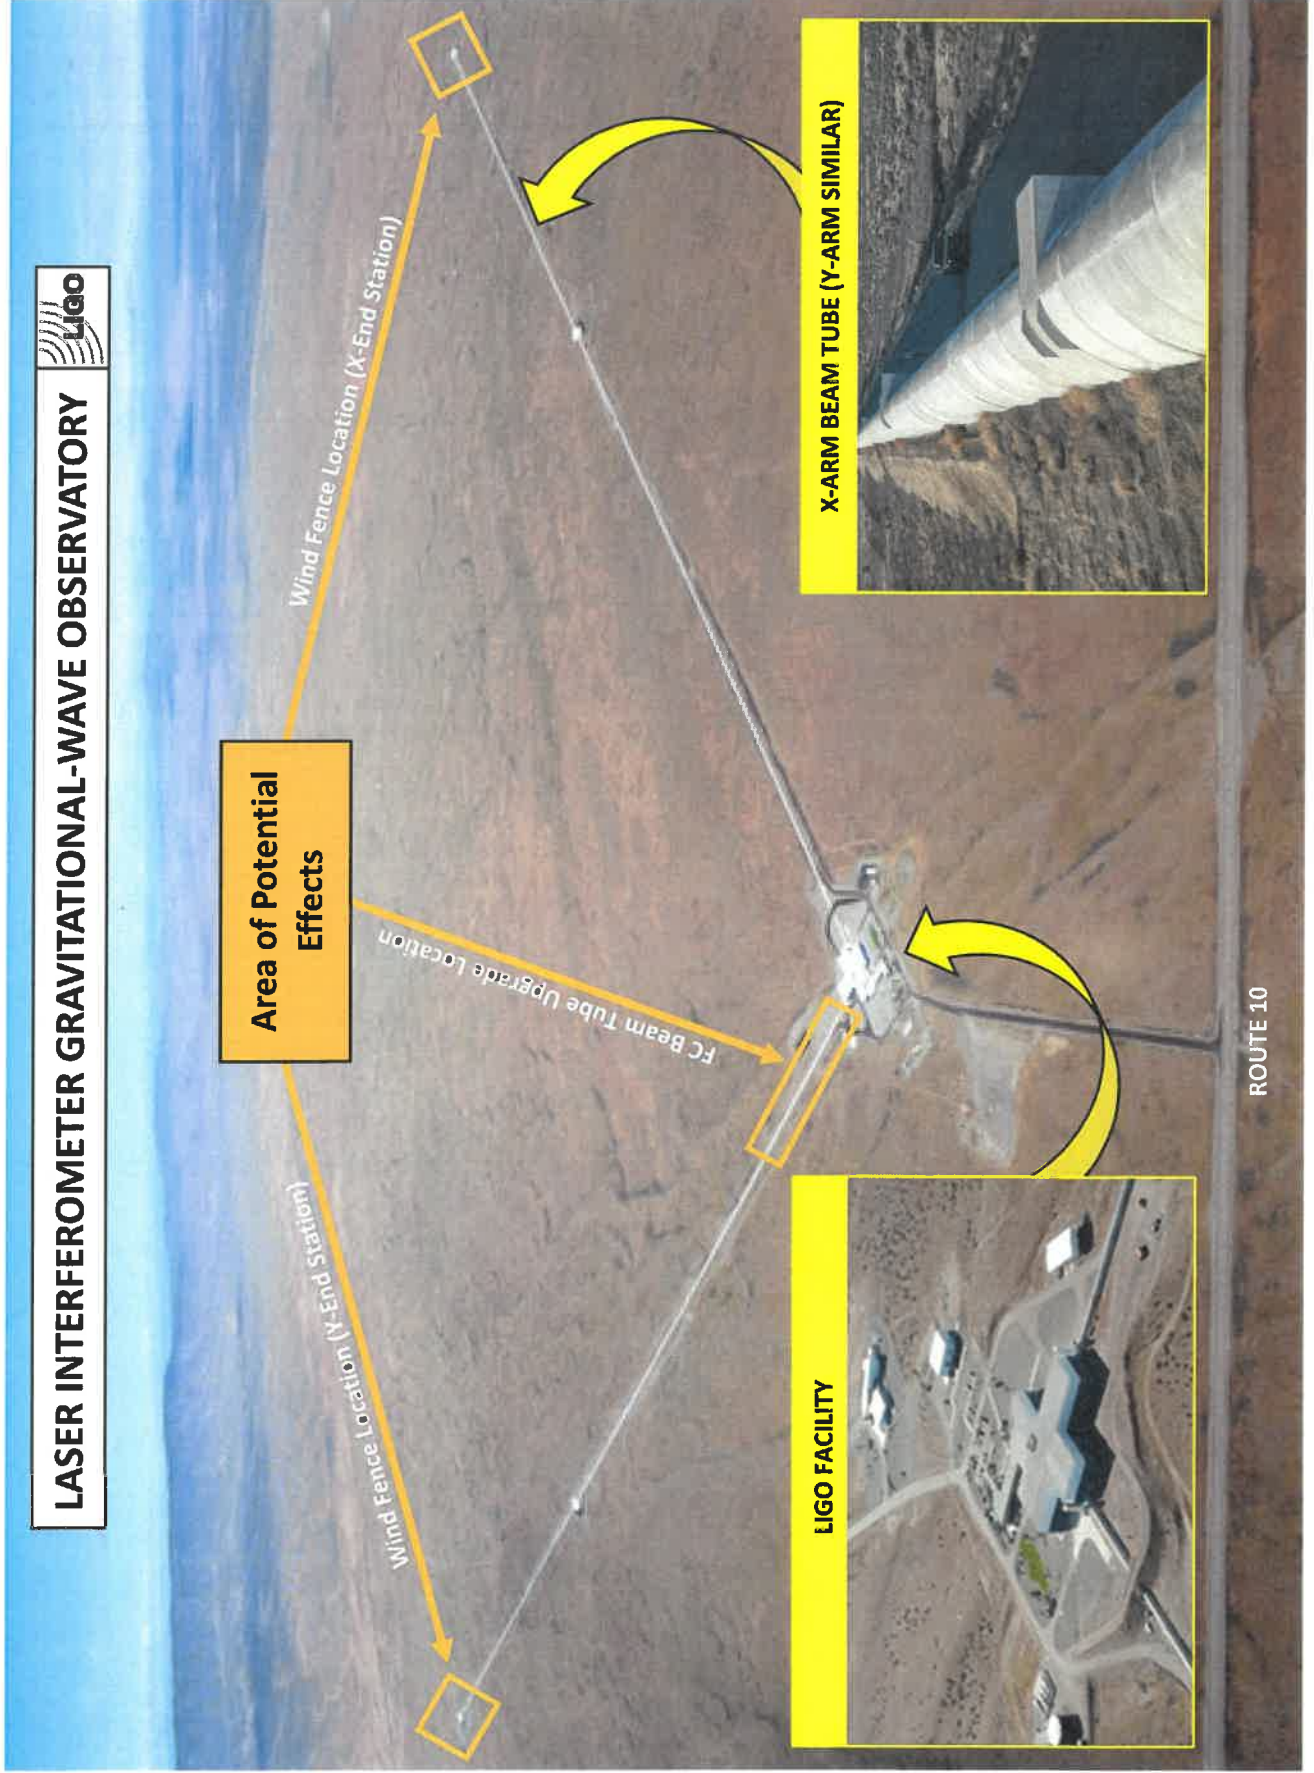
Filter Cavity (FC) Beam Tube and End Station Site Plan
